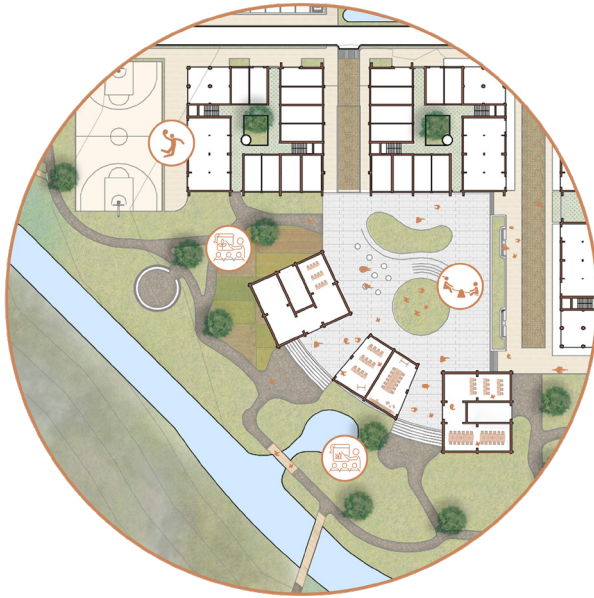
Floor Plan Ground Floor of the “School Tower”
